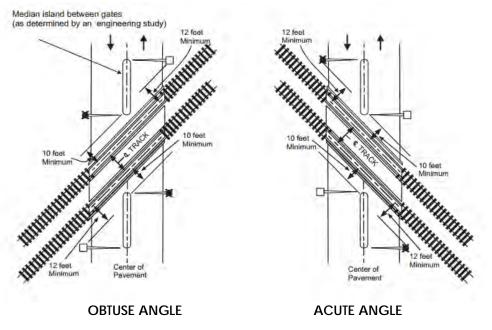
Crossing Gate Spacing Requirements at Angled LRT Crossings
